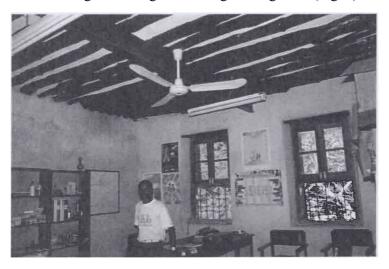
A steel beam instead of a wall supports the ceiling load. Source: Author's records.
